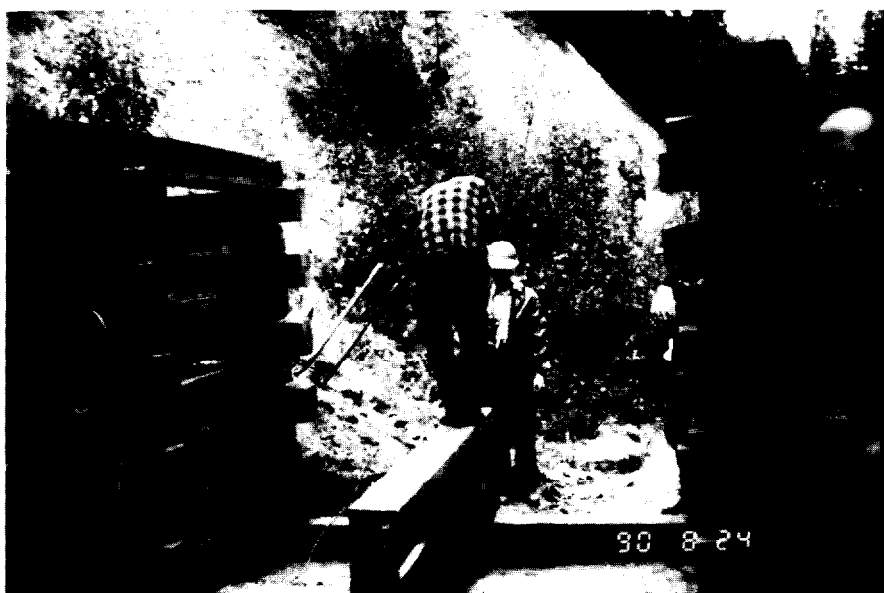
Constructing the rock-crib check dam in Cal-Idaho Gloryhole. 1990.
